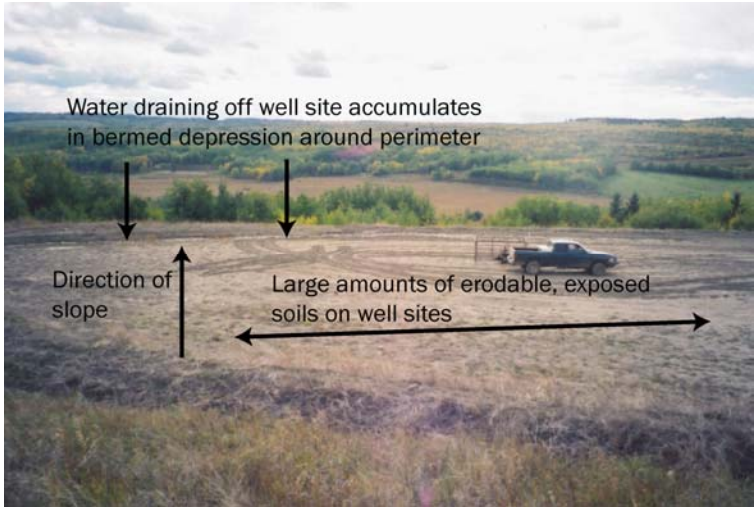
Exposed soils on oil and gas wellhead site. Note water retention ditch surrounding down-slope perimeter.
